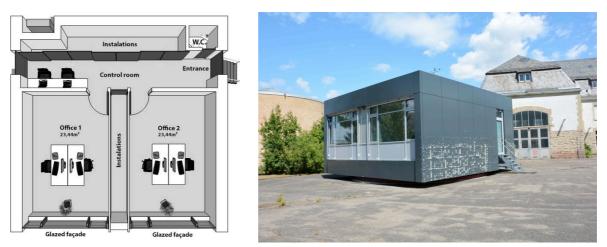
Floor plan and the LOBSTER test facility in summer (July 2015).
